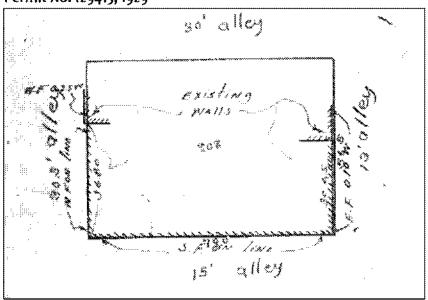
Detail, plat of existing building in Lot 808. Permit to Build No. 129415, November 21, 1929, National Archives and Records Administration.
